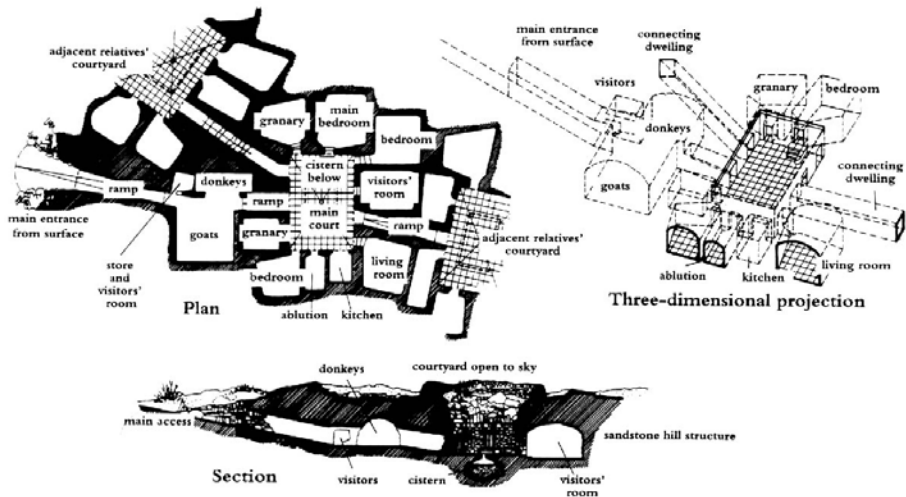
Typical plan, section, and isometric view of an underground dwelling in Matmata, Tunisia⁽¹⁾.
